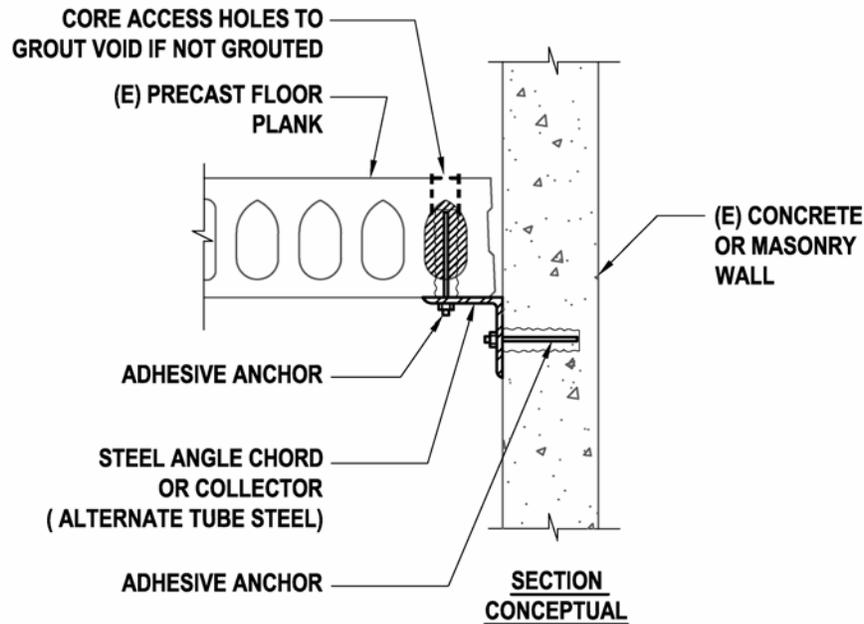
Steel Chord or Collector at Floor Perimeter without Cast-In-Place Topping
